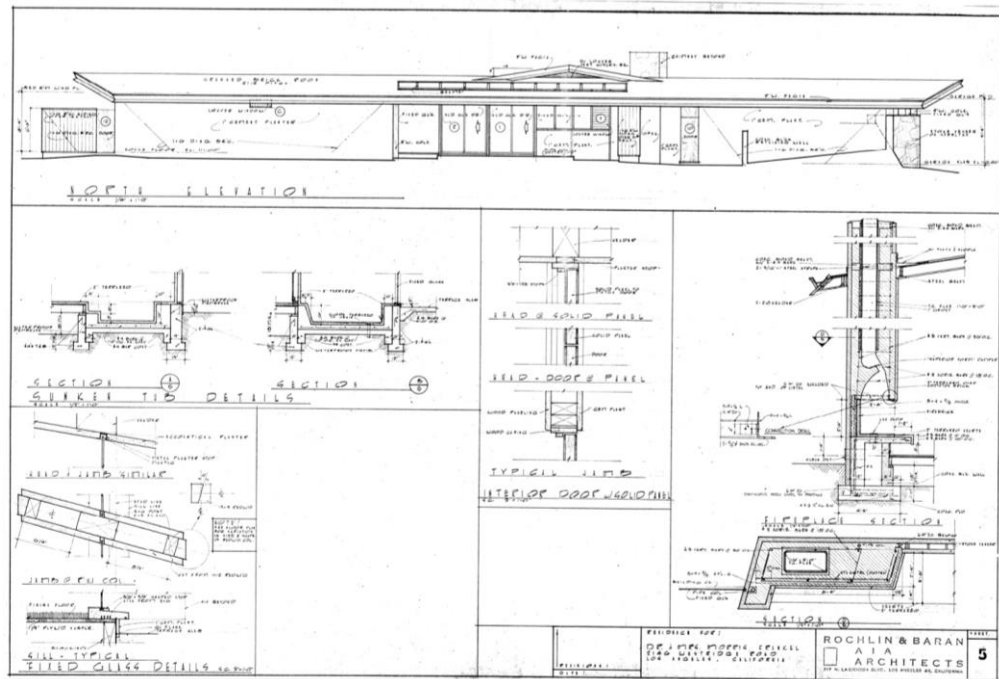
Frankel House elevation and details by Rochlin & Baran. Source: Private collection.
